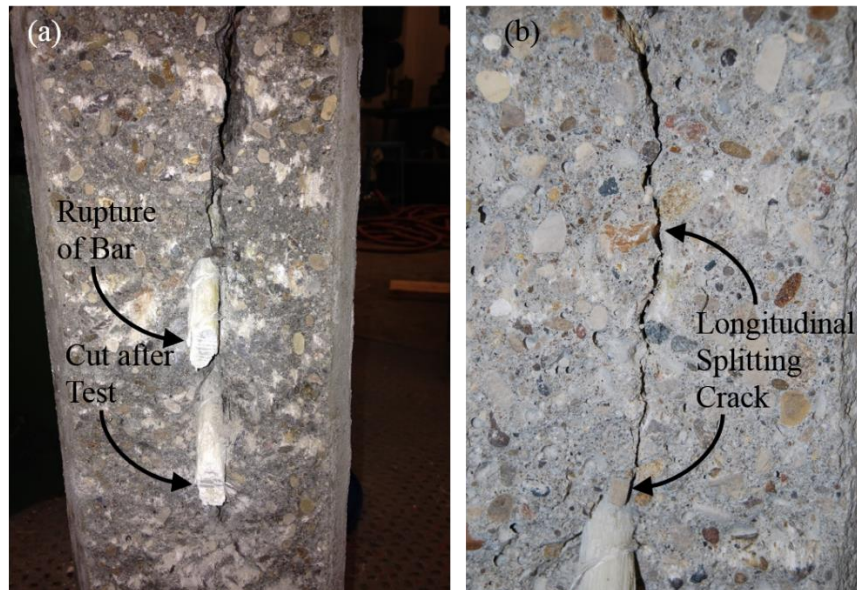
Failure of 90-degree Two-Bar Specimen: (a) Rupture of Reinforcement; (b) Longitudinal Splitting Crack
